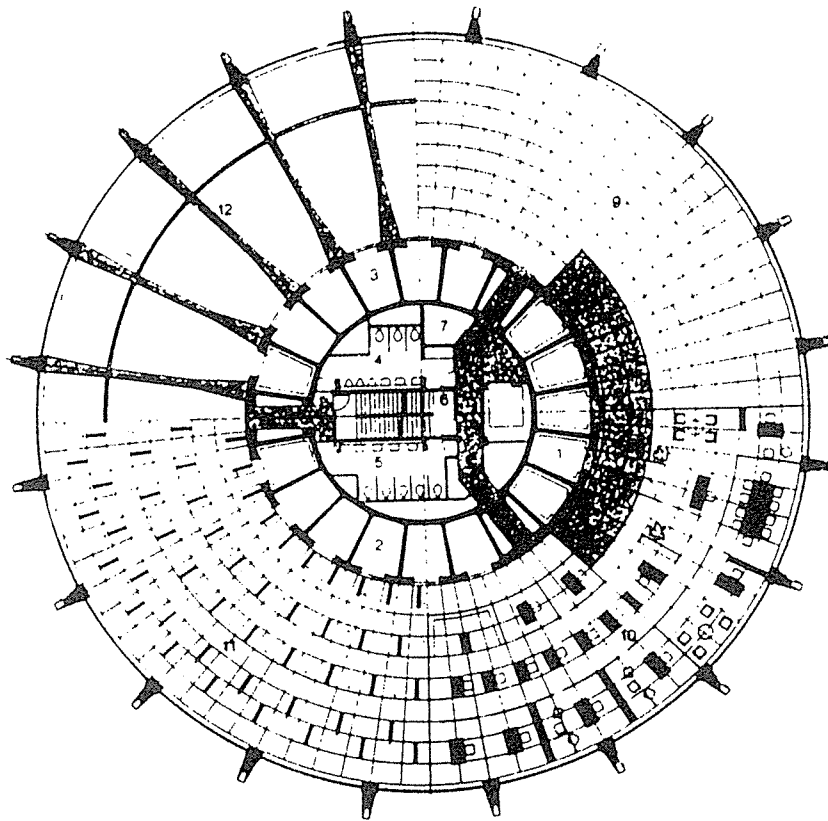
Layout of the Australia Square Building Showing Convex Shaped Lift Well Face
